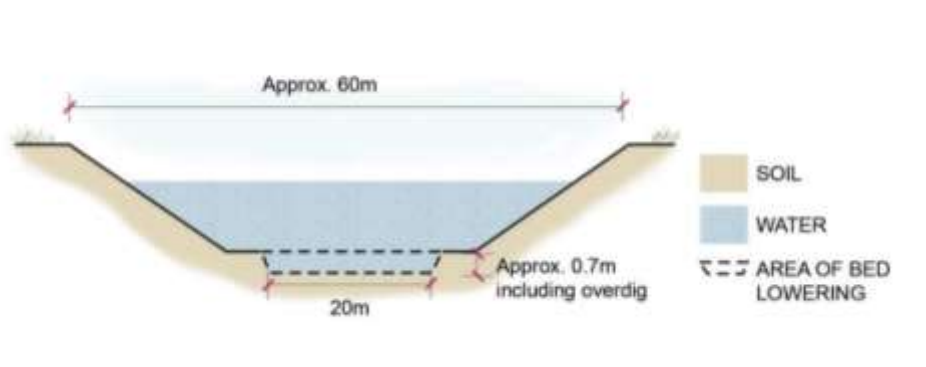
Cross-section of proposed bed lowering in the River Thames downstream of Desborough Cut (not to scale).
